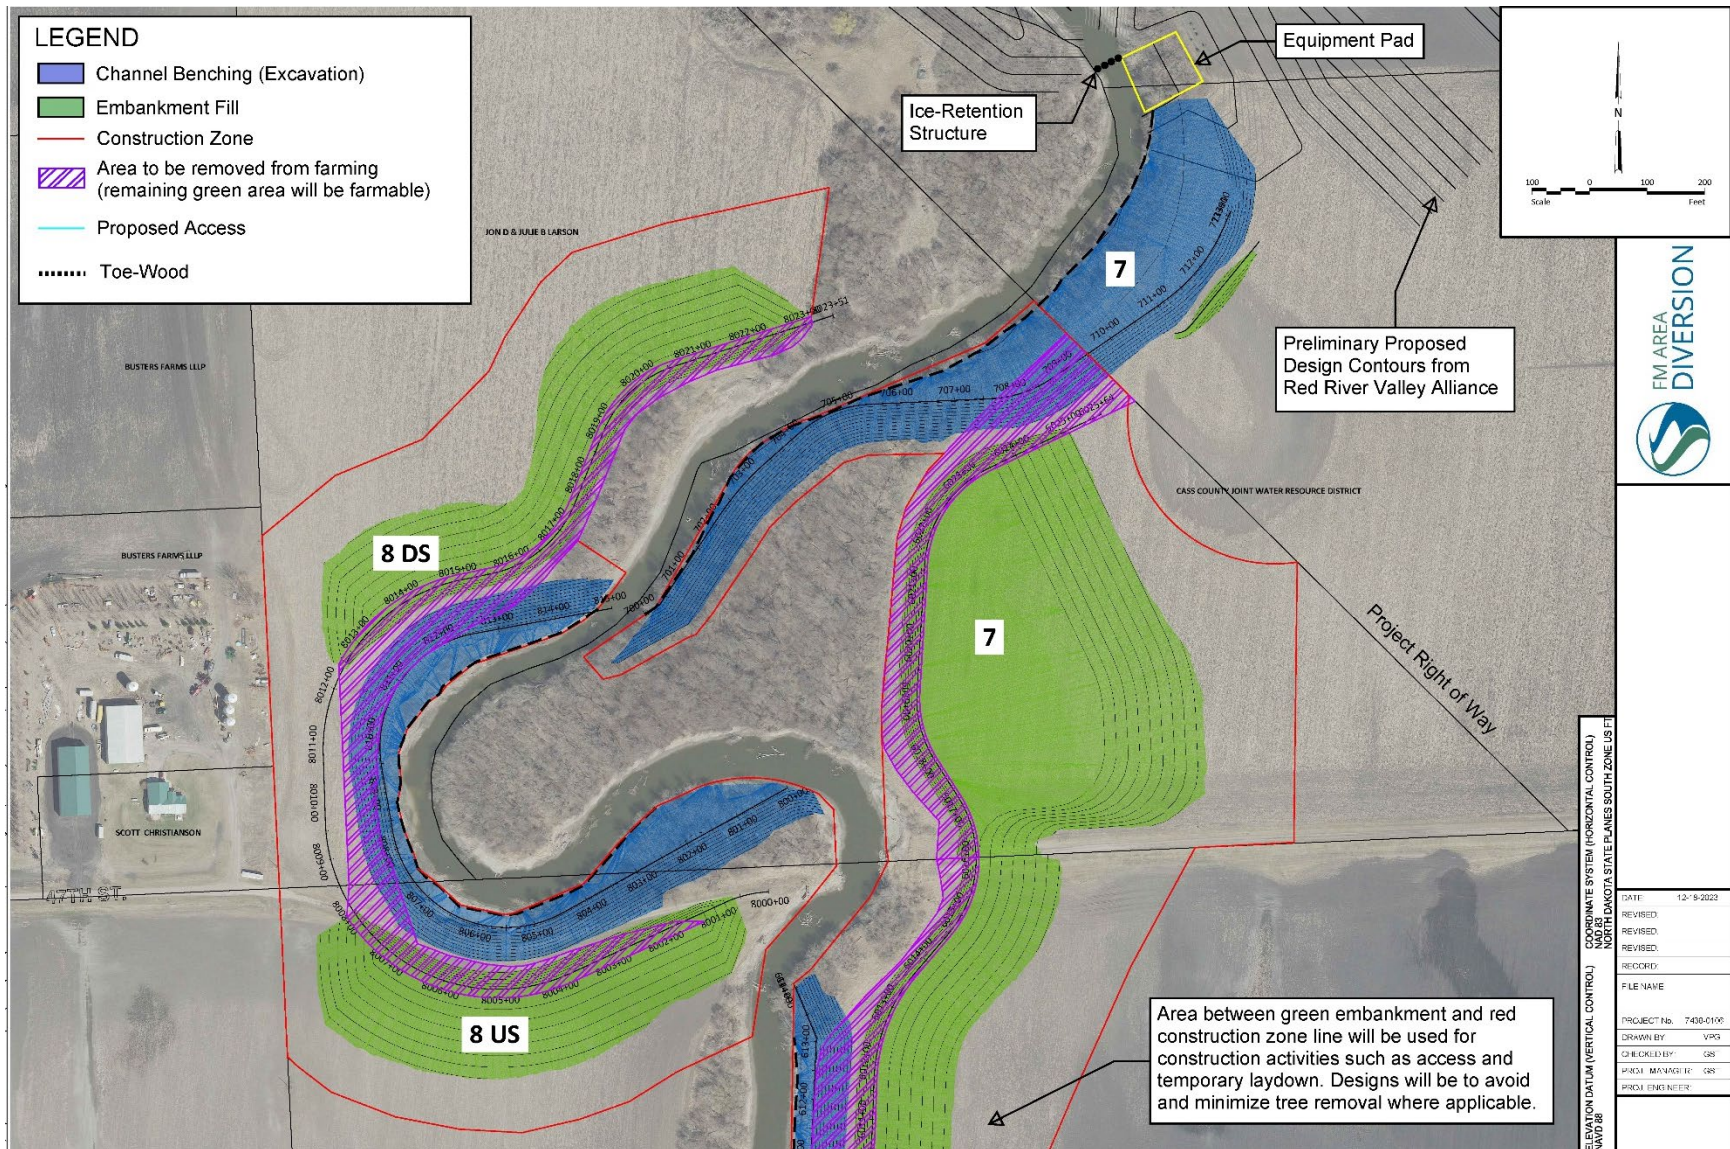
Sheyenne River Proposed Alternative Benching Detail (Figure 1 of 4)
